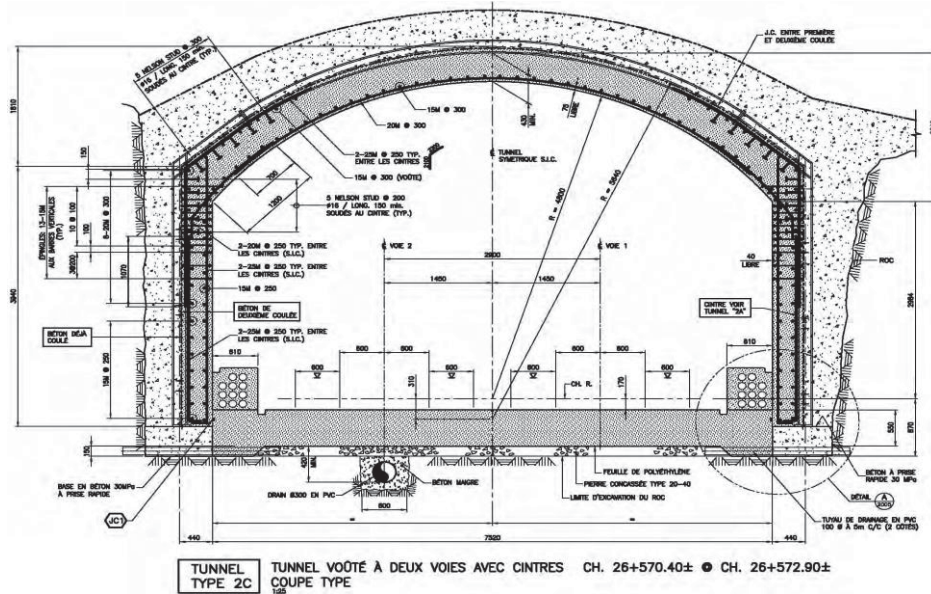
Montreal-Laval metro extension cross section and support details (SNC-Lavalin, 2010)
